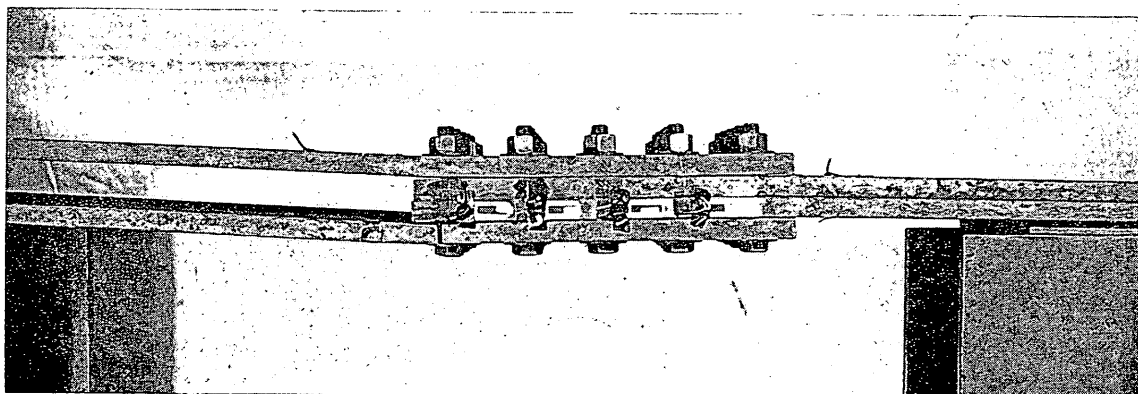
EDGE VIEW OF JOINT B4 FAILURE
